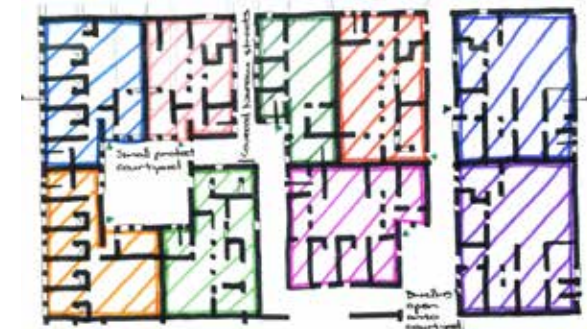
New Baris Village - Dwelling layouts to create cool spaces in between
